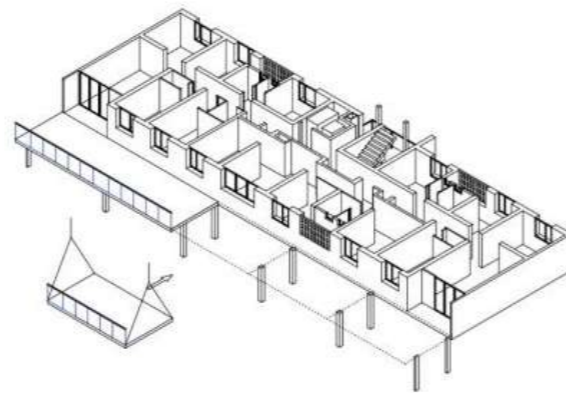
Transformation Project, building G new Floor Plan. © Lacaton&Vassal.
